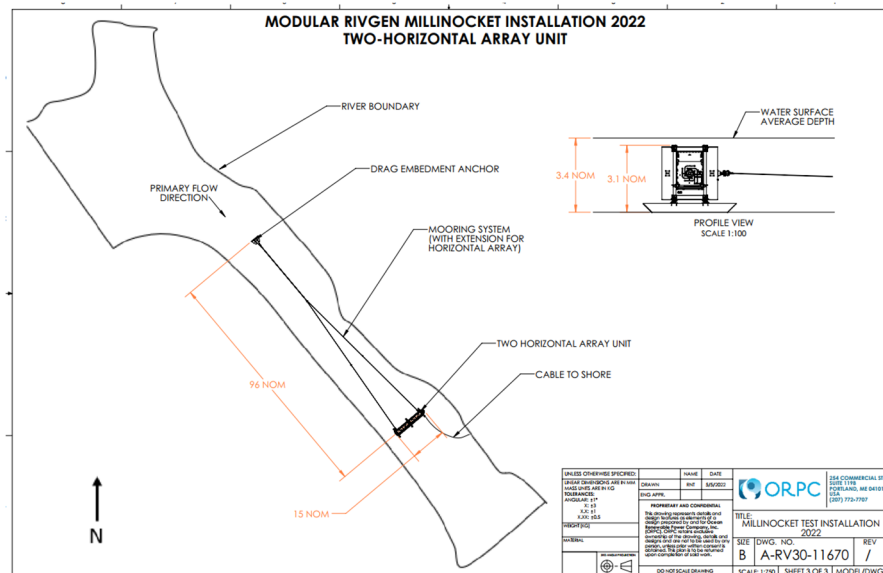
Two Modular RivGen device layout, Millinocket, ME.
